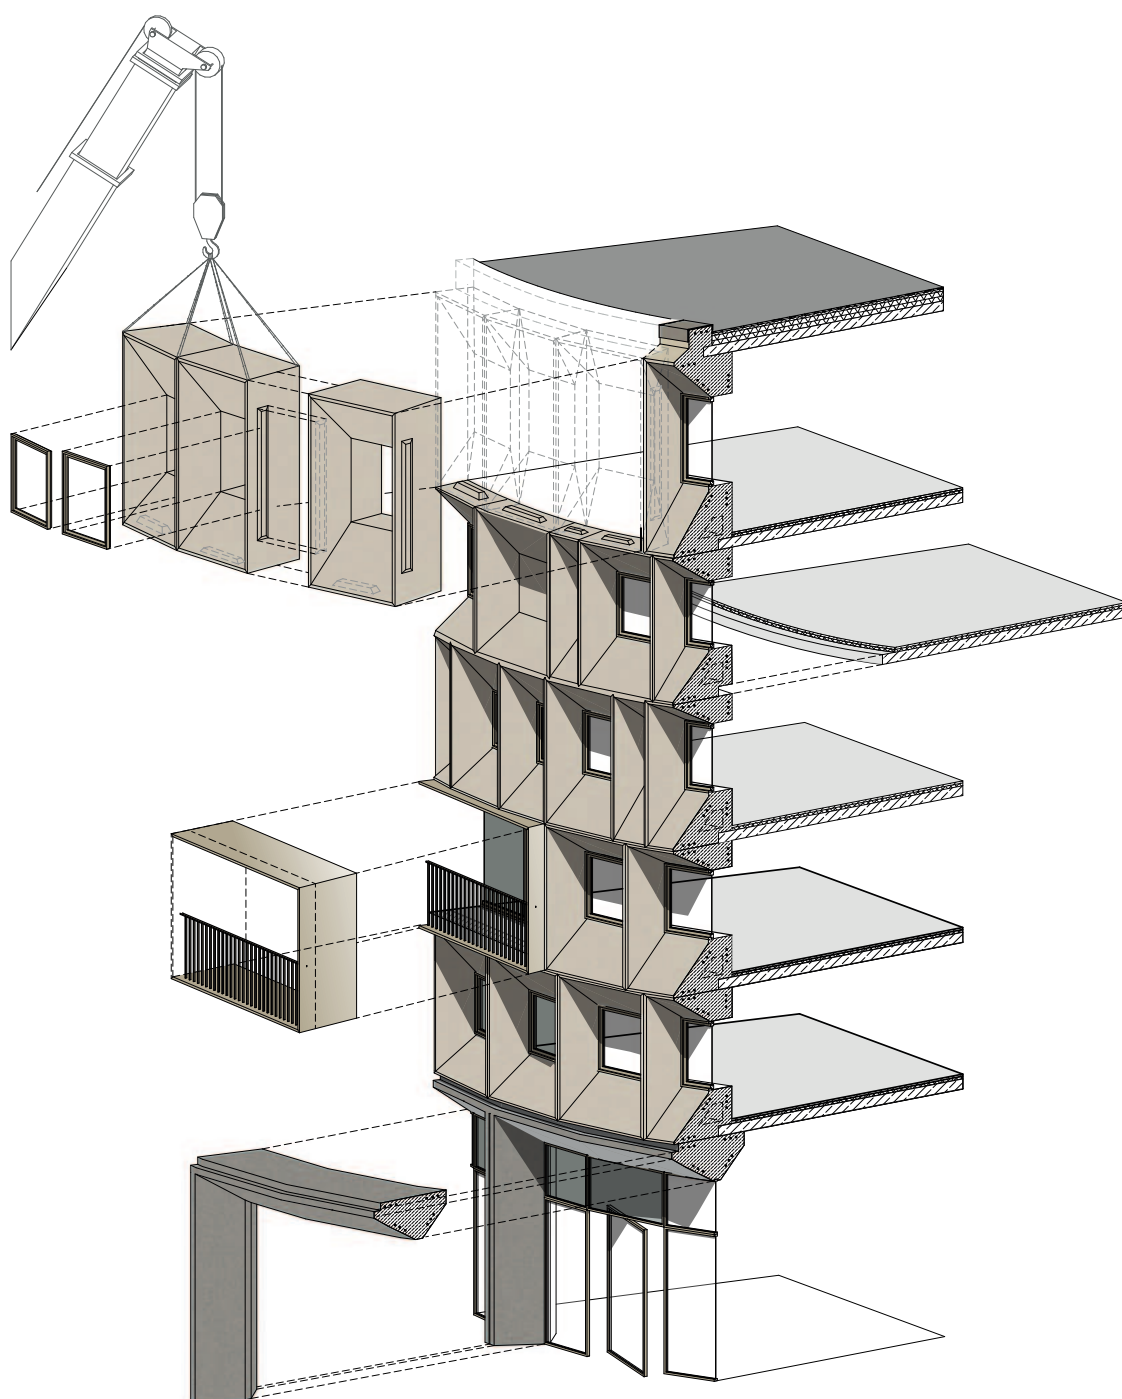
/ Left side / Isometric view of facade section proposing the assembly on site
